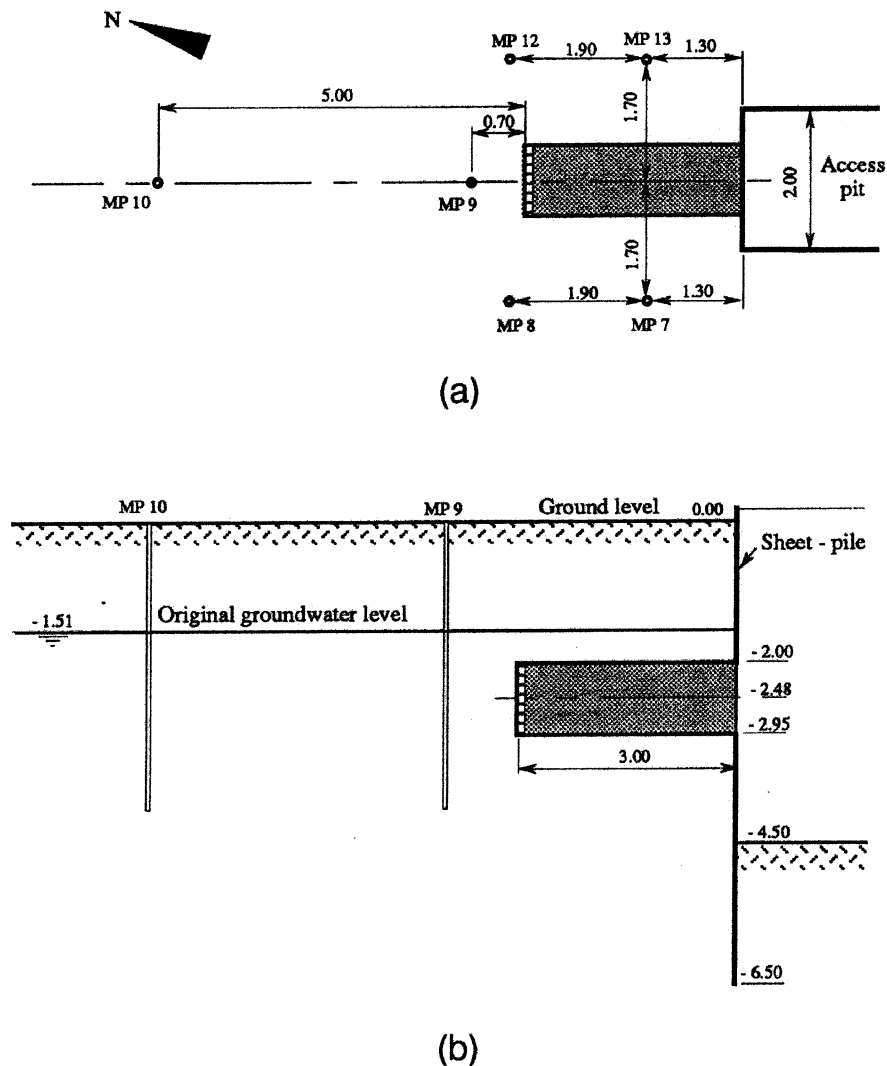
Layout of the experimental microtunnel. (a) Plan view. (b) Longitudinal profile. All measurements are given in metres.
